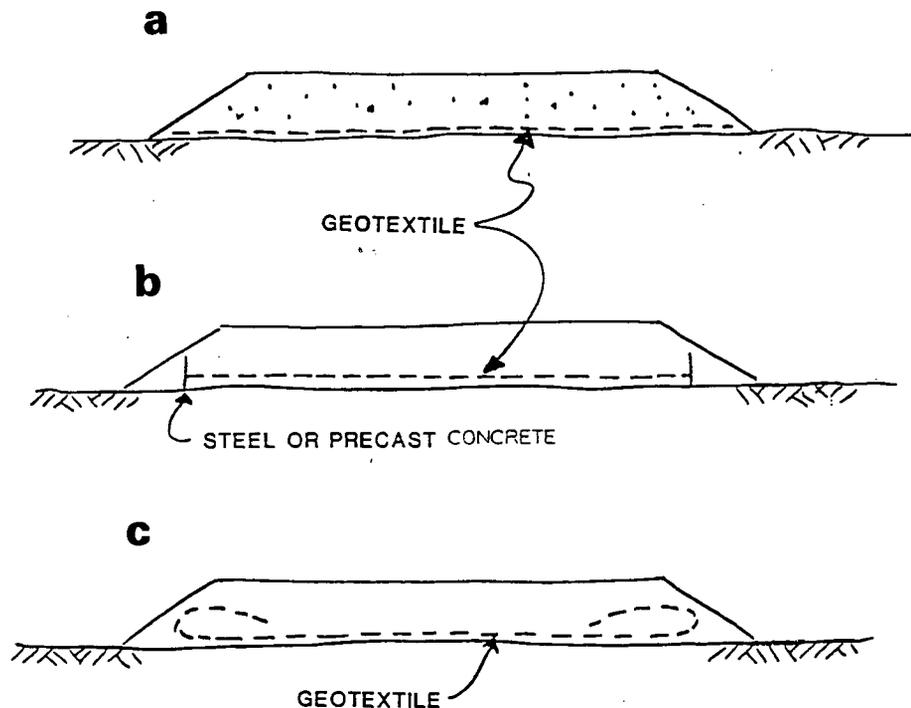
Concepts for using geotextiles to reinforce embankments on soft foundations (58).
